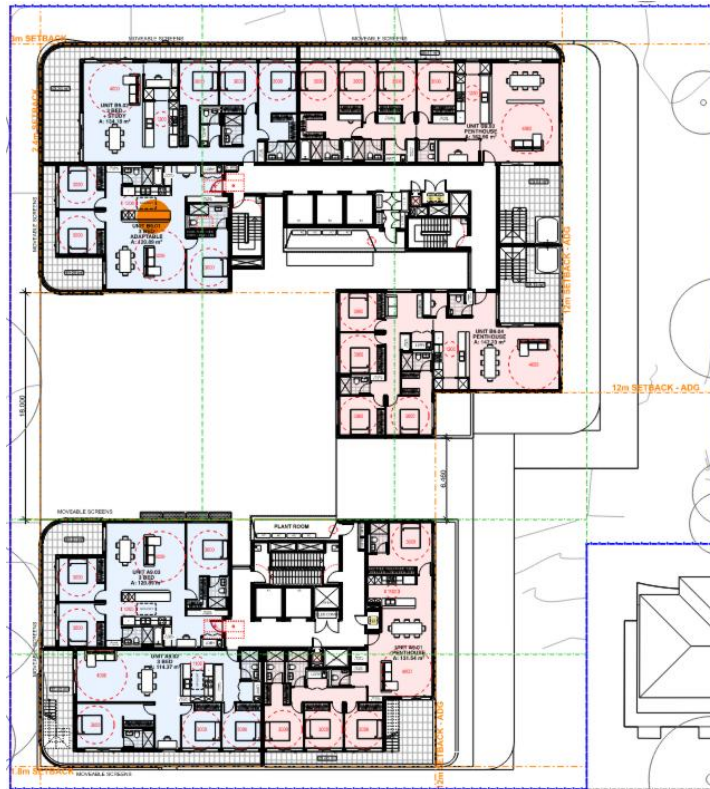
Eighth Floor Adaptable Unit Location on Architectural Plans
